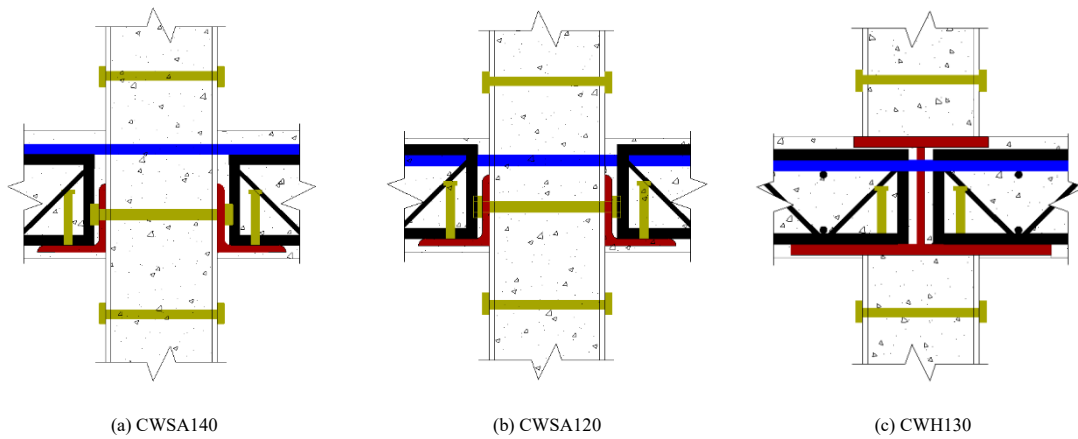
Structure of joints of DSC shear wall and steel truss floor slab
